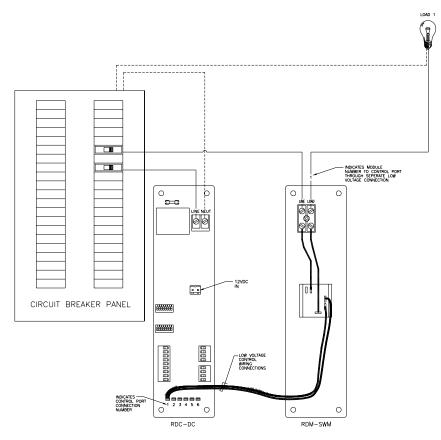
RDM-SWM Switch Module 2400 line wiring configuration
